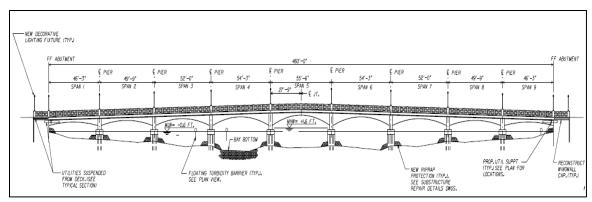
Venetian Causeway Bridge 12 (8DA14384), Elevation View
